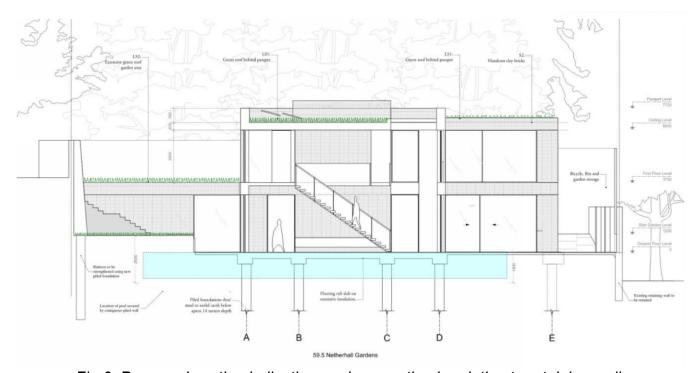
Proposed section indicating pool excavation in relation to retaining walls
